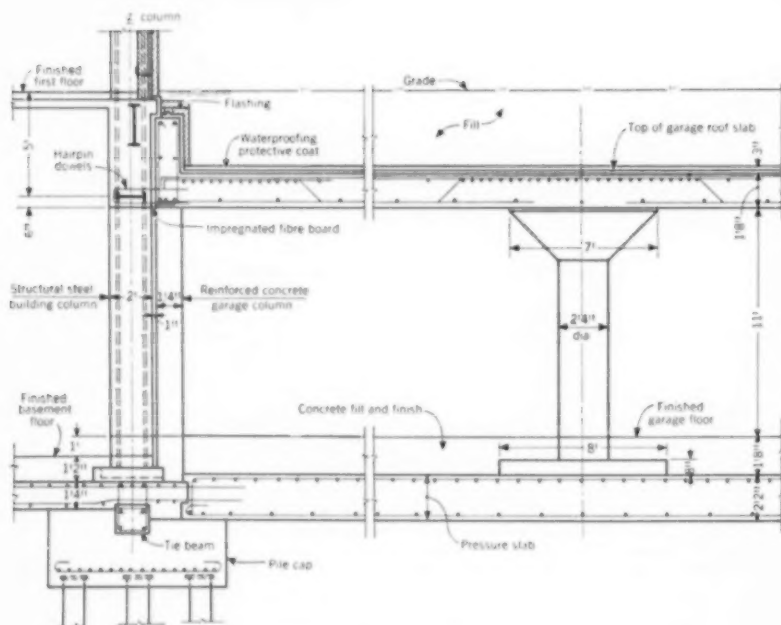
Where garage roof slab meets building wall, carefully designed joint is used to secure watertightness and rigidity.
